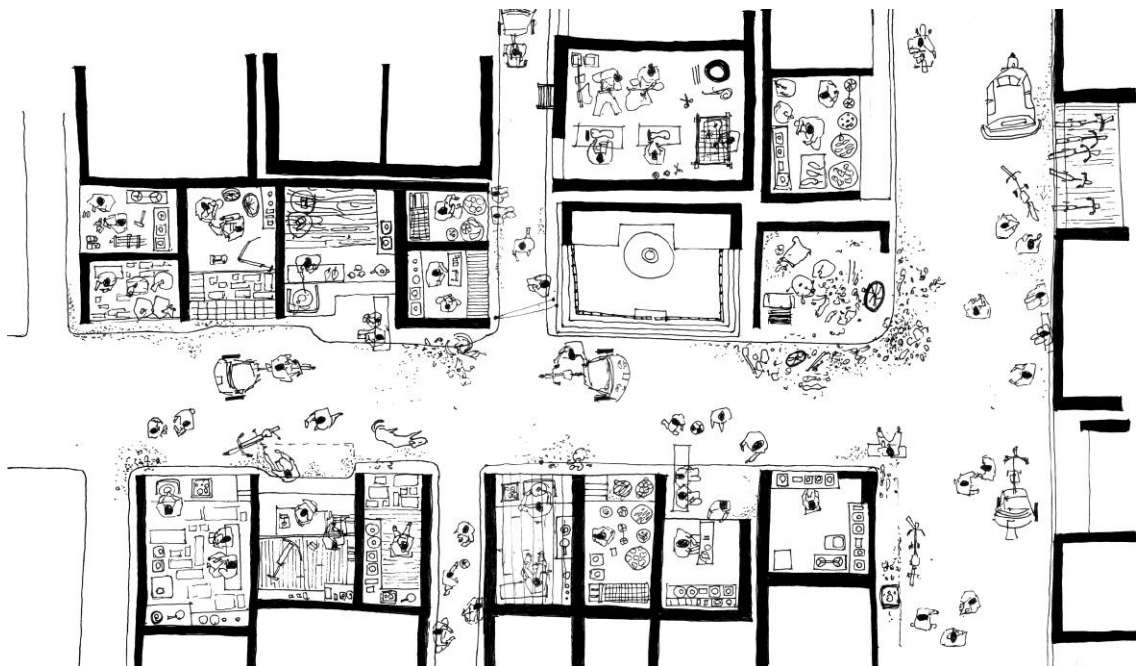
Dwelling units placed on two sides of common walls and the narrow streets flanked by them
